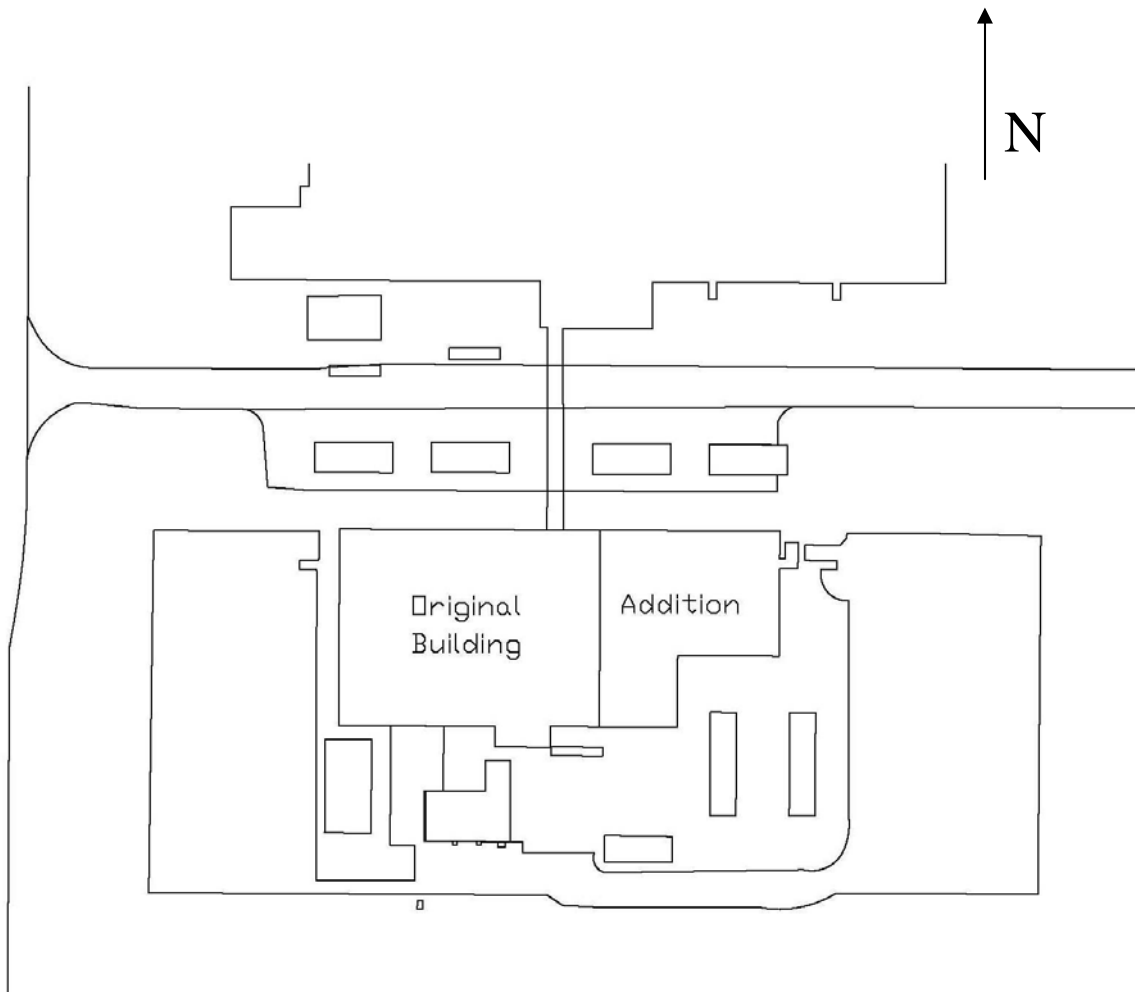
Flight Crew Training Building, showing original portion and addition.
